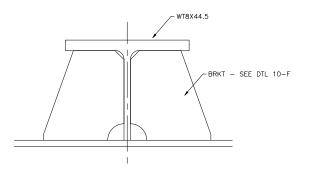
B SPUD WINCH SUPPORT BEAMS SCALE: 3/8"=1'-0"
